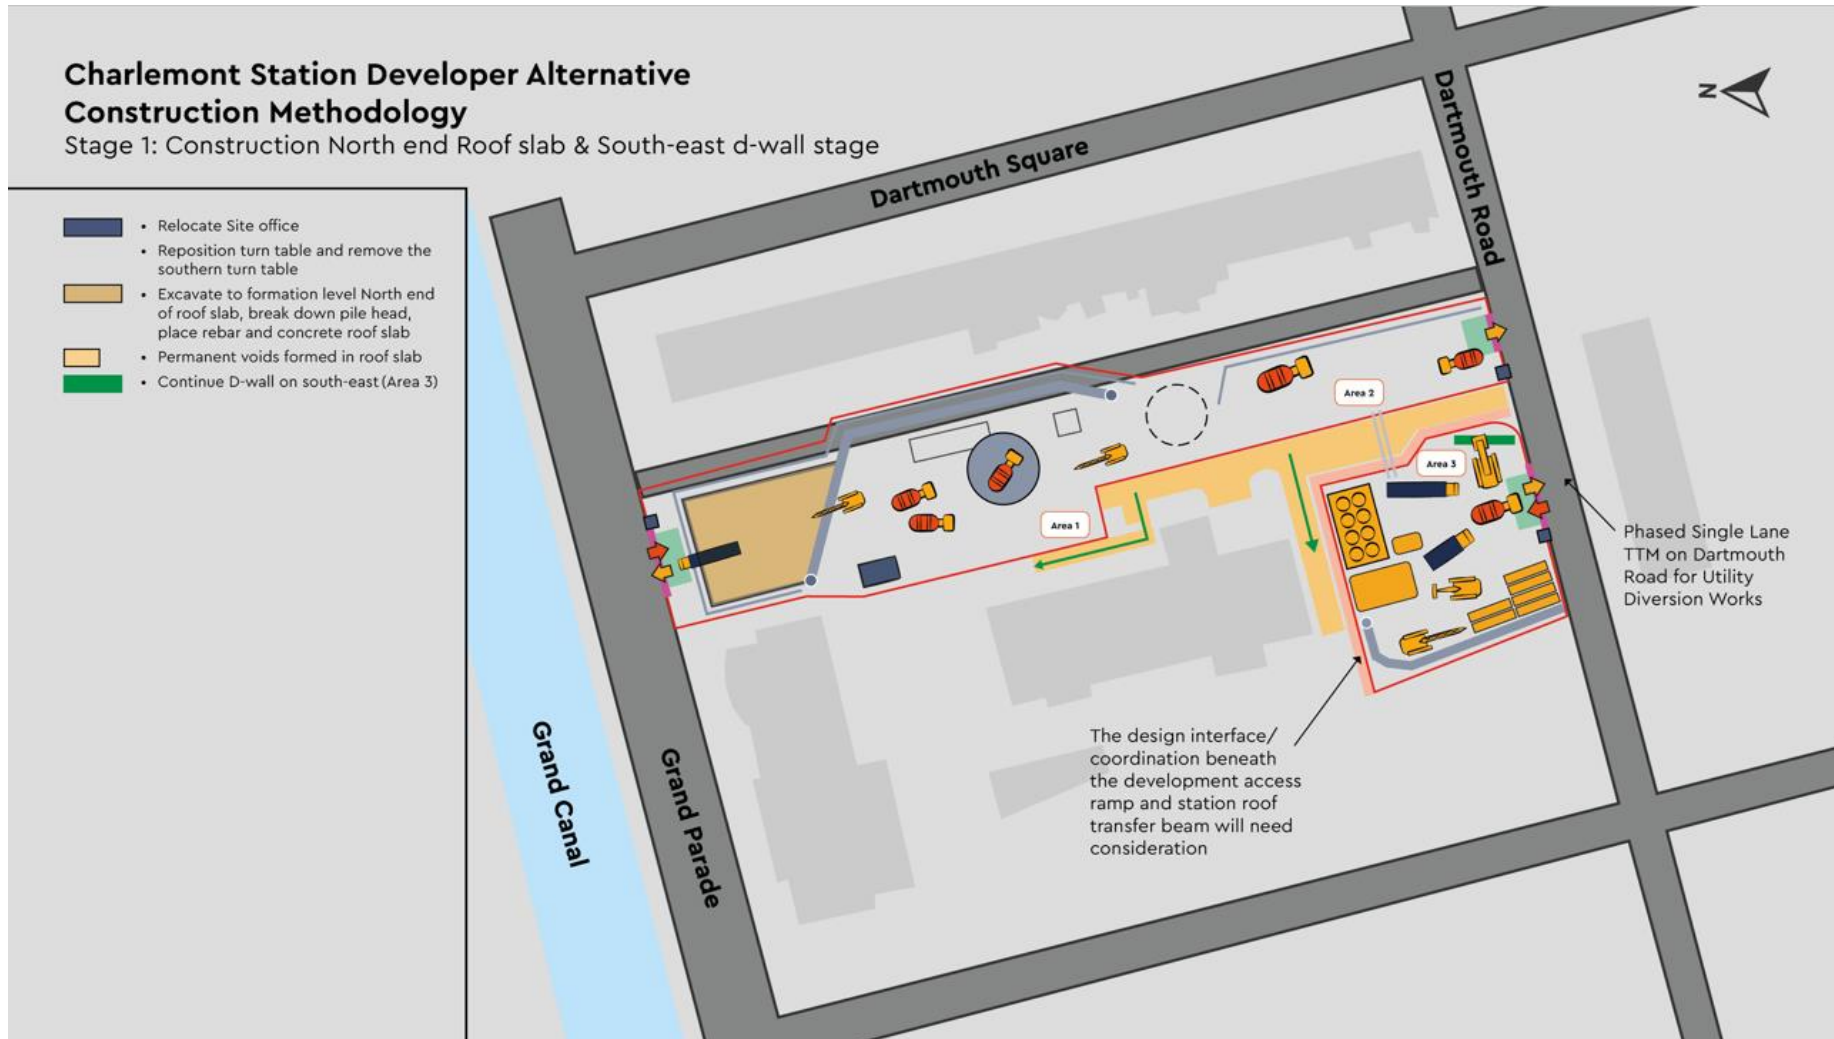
Charlemont Station Stage 1 – Construction North end roof slab & South-east d-wall stage
